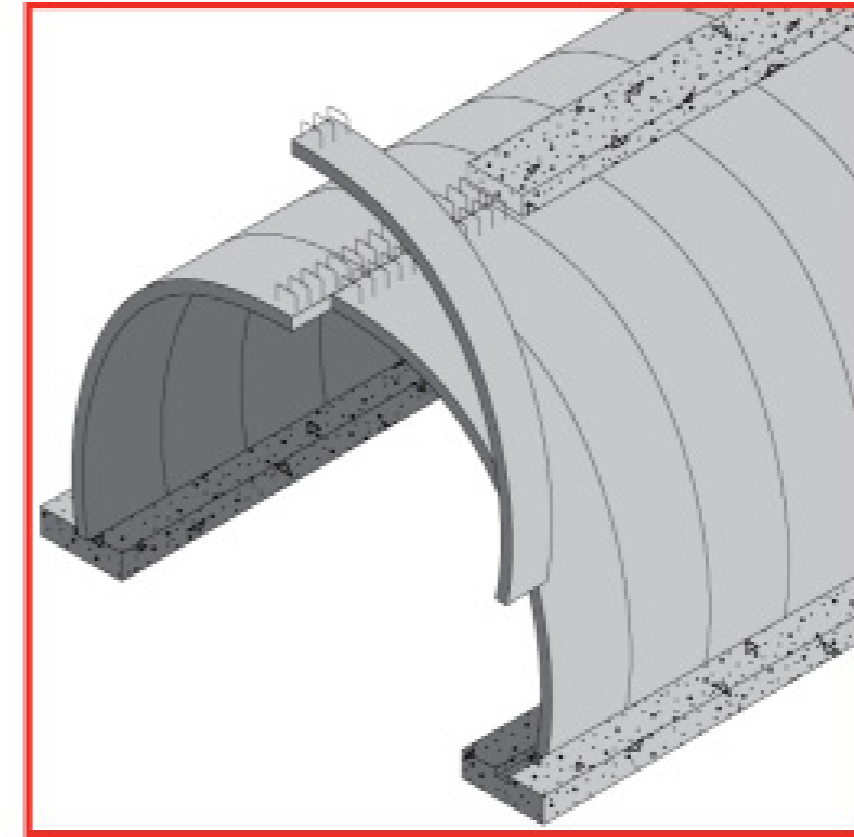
Precast concrete arches for tunnels, source: reinforcedearth.com
